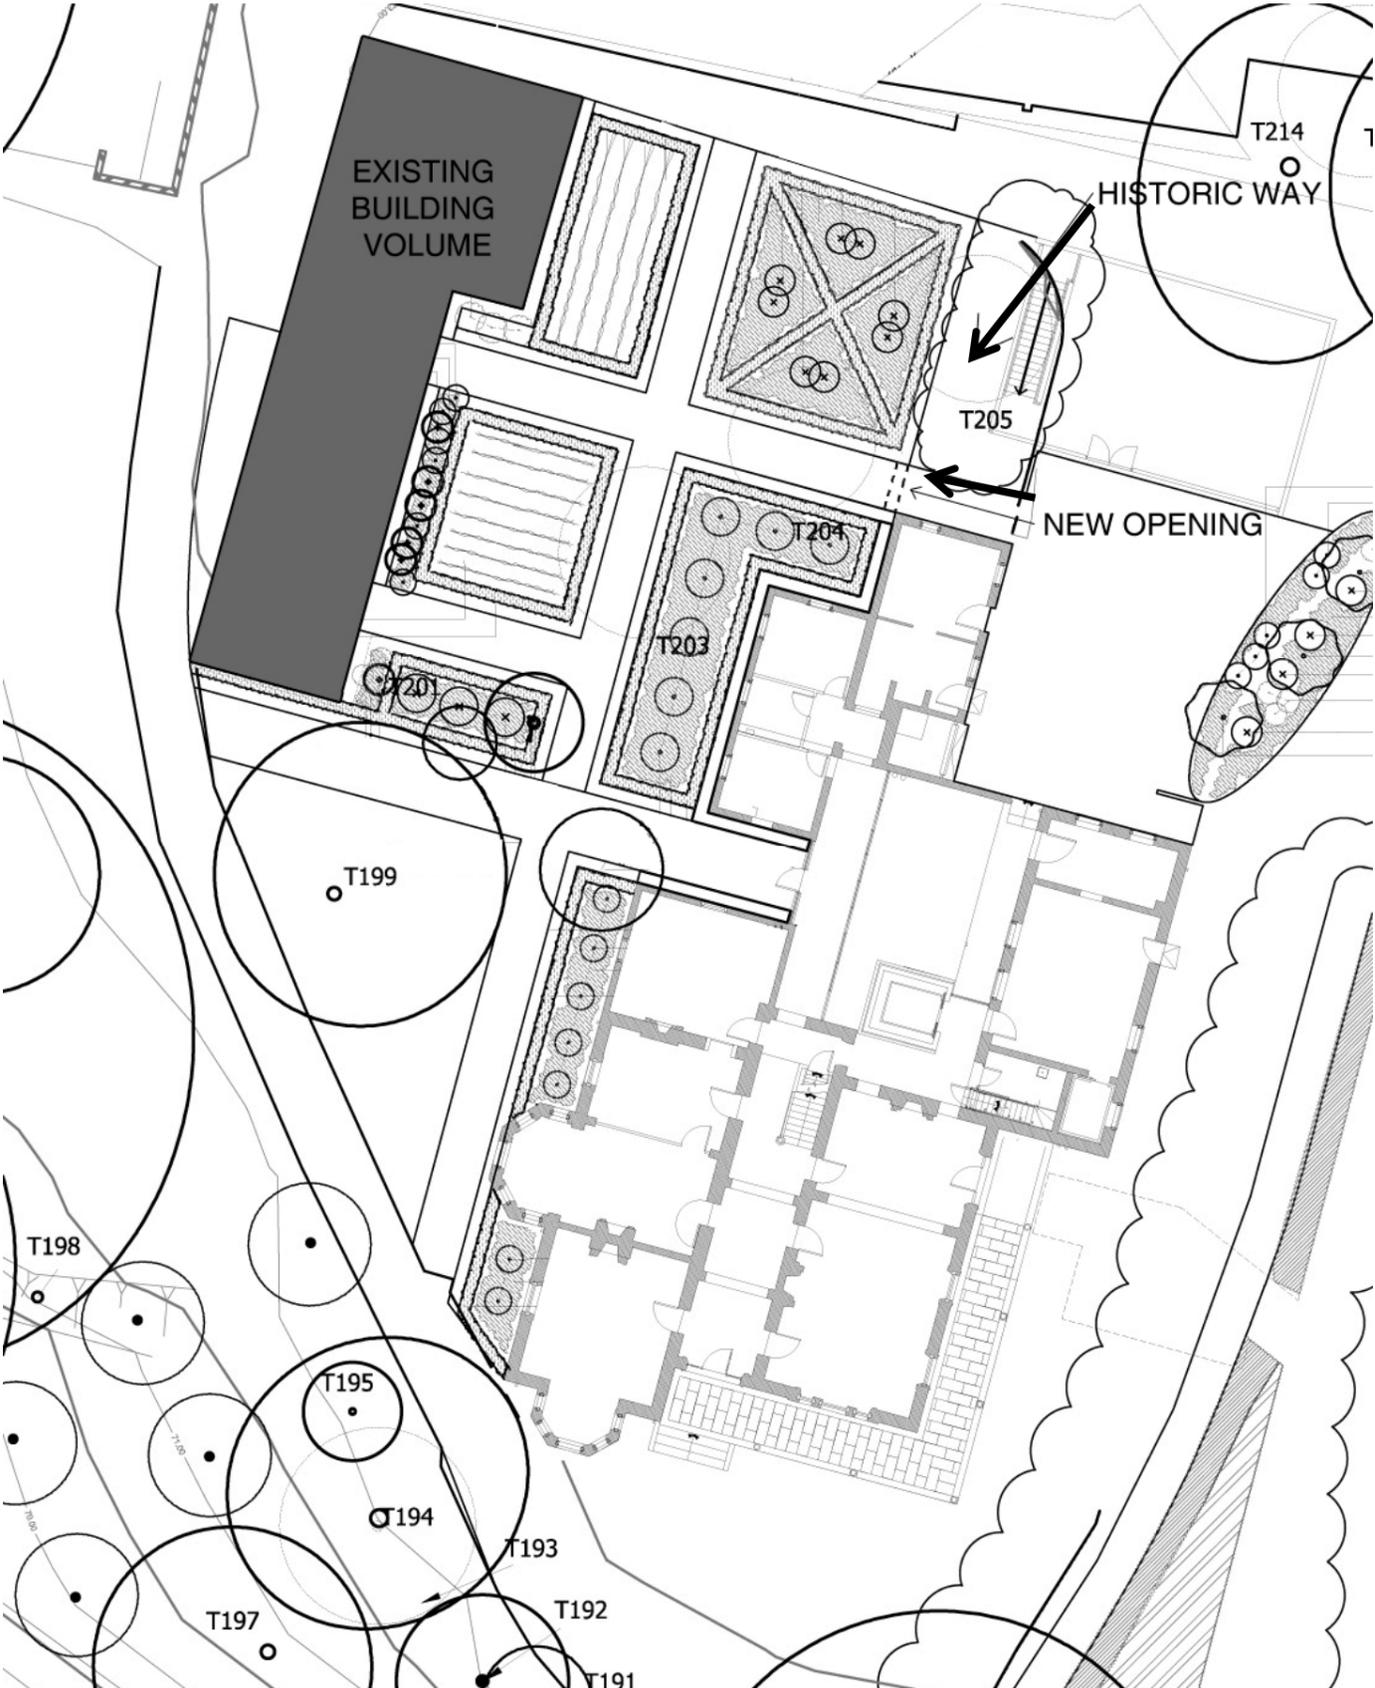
Plan of proposed renewed Formal Garden (Taylor Brammer)
